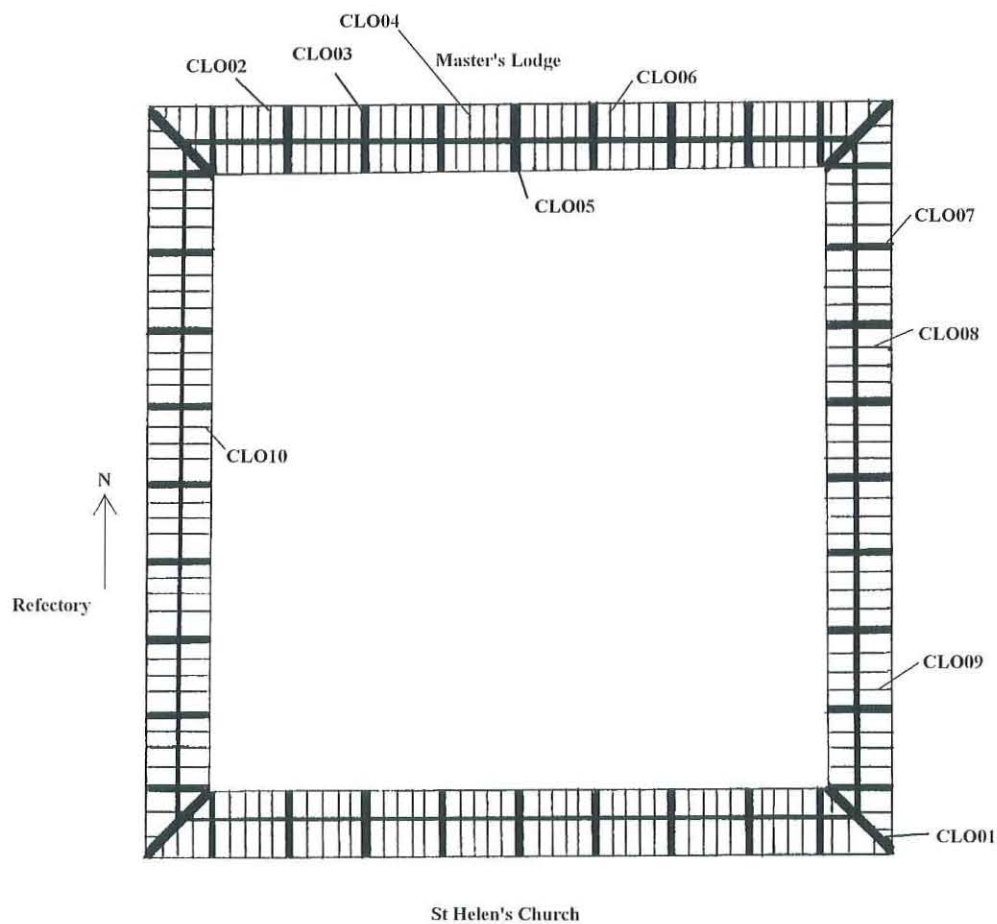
Sketch plan of the cloister roof (not to scale) showing the timbers sampled for dendrochronology
